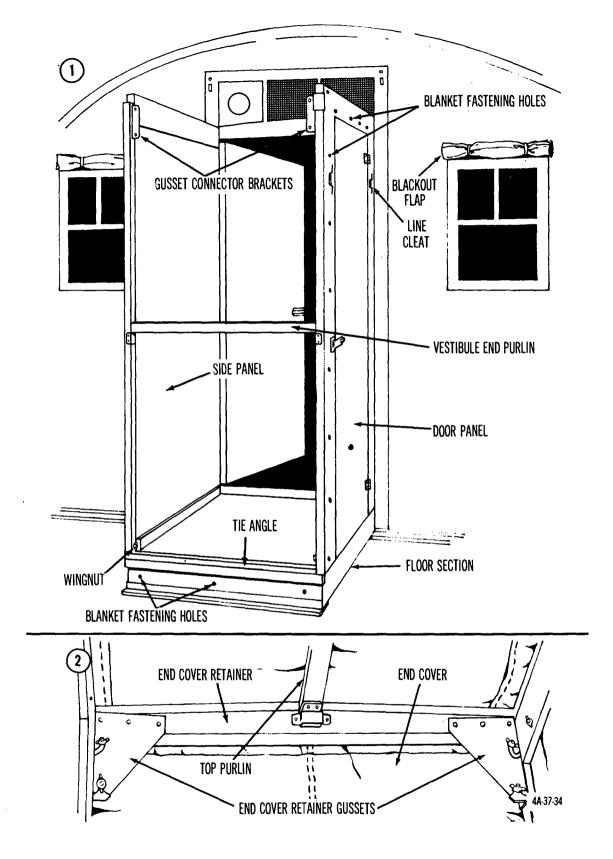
Attaching vestibule to tent frame-type, insulated, sectional.
